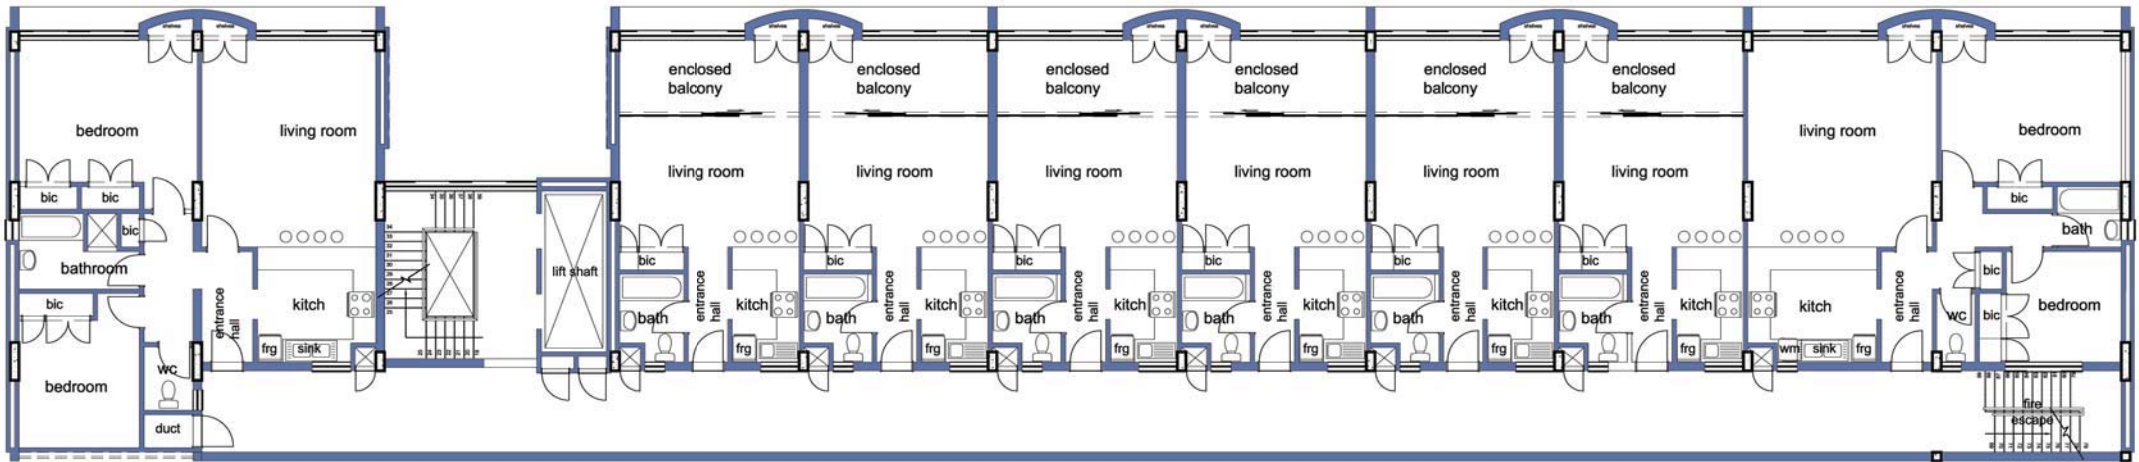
The secondary structure of the building consists of brick infill walls. These walls form barriers between units and divisions between spaces within each unit. Additional stiffening is provided by the walls of the lift shaft and staircases.
